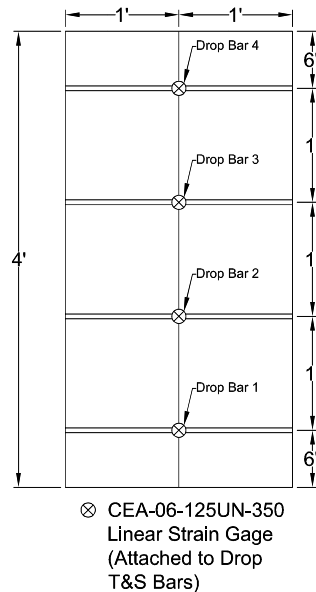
Plan View of Strain Gages 5 in. Above Bottom of Precast (Tapered Embedded Plate and No Connection)
